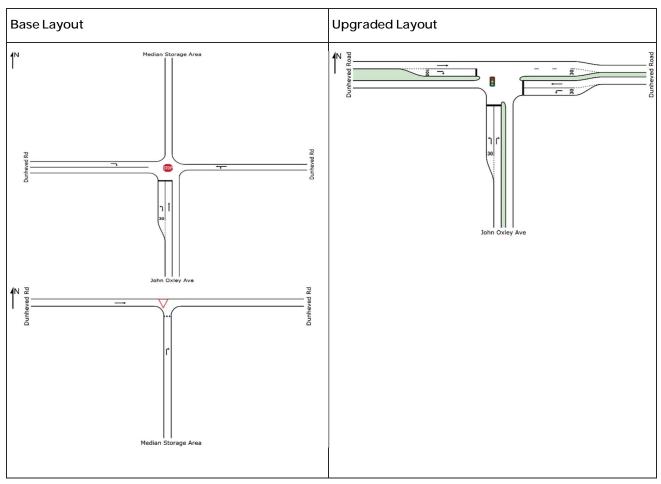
2026 with Links Road extension - Dunheved Road/John Oxley Avenue
